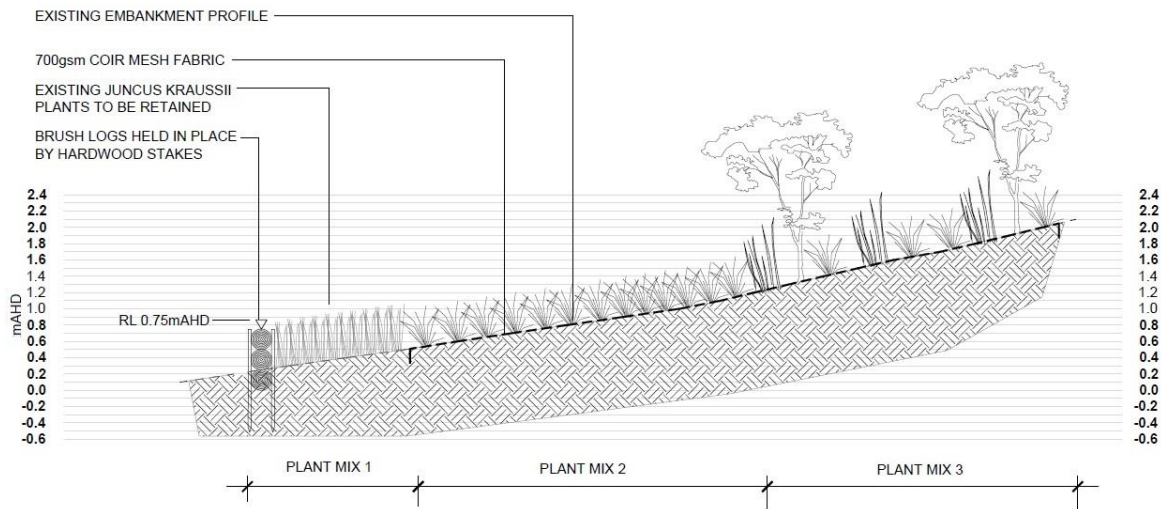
Example of a typical section showing brushwall on foreshore profile (Source: Syrinx)
